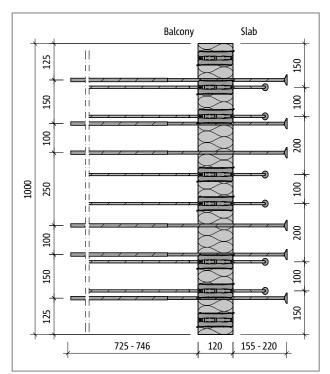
Schöck Isokorb[®] XT type K-U-M2: Product plan view
